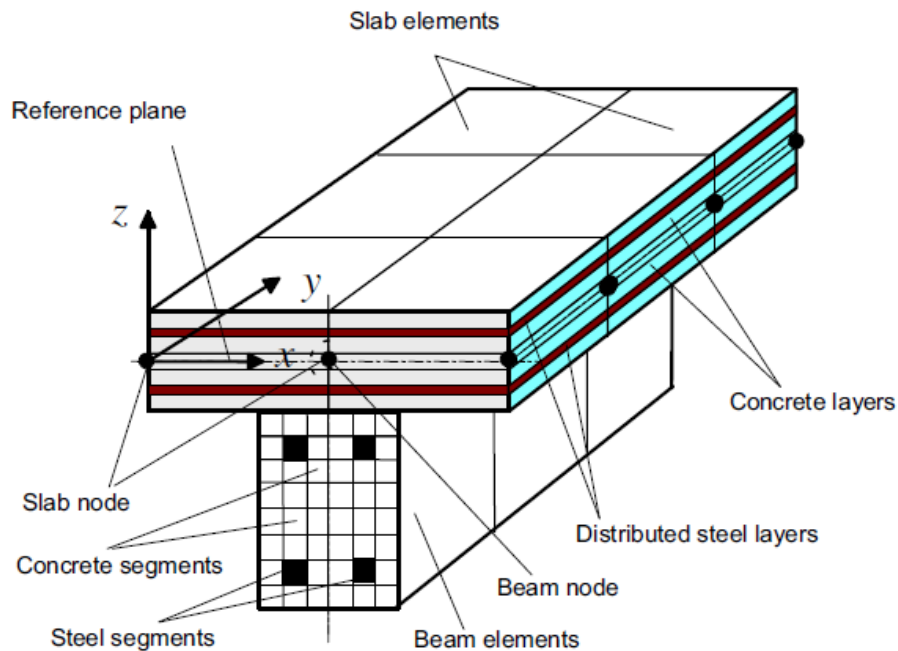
Slab and beam elements in VULCAN (Huang, 2010)
